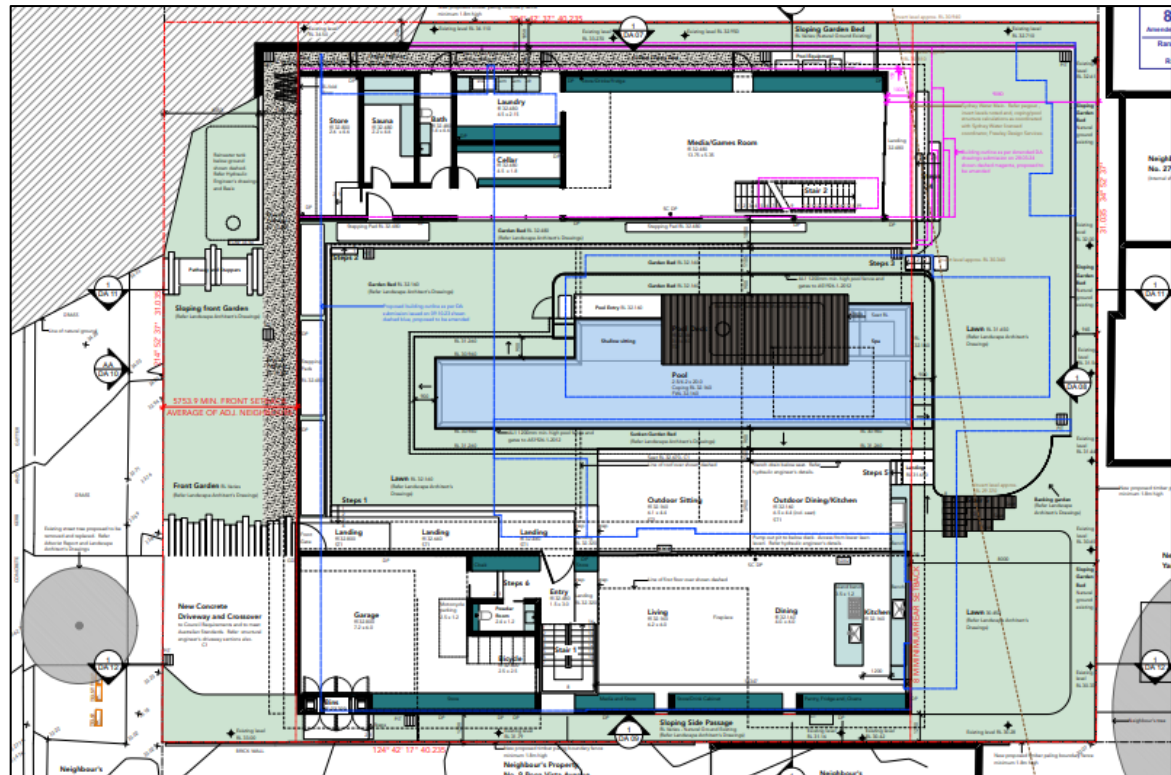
Ground Floor Plan of subject Development – 3-7 Bona Vista Avenue (Source: Dominic Levene)
